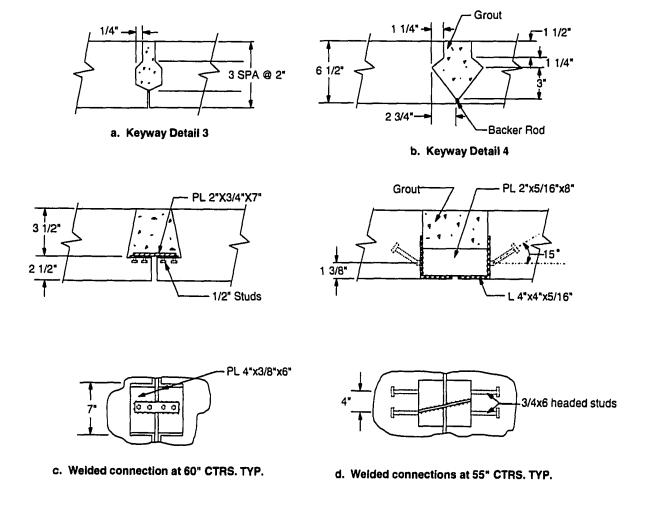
Typical connection detail used by Stanley Structures and by Genstar Structures and the Alberta DOT, Canada.
